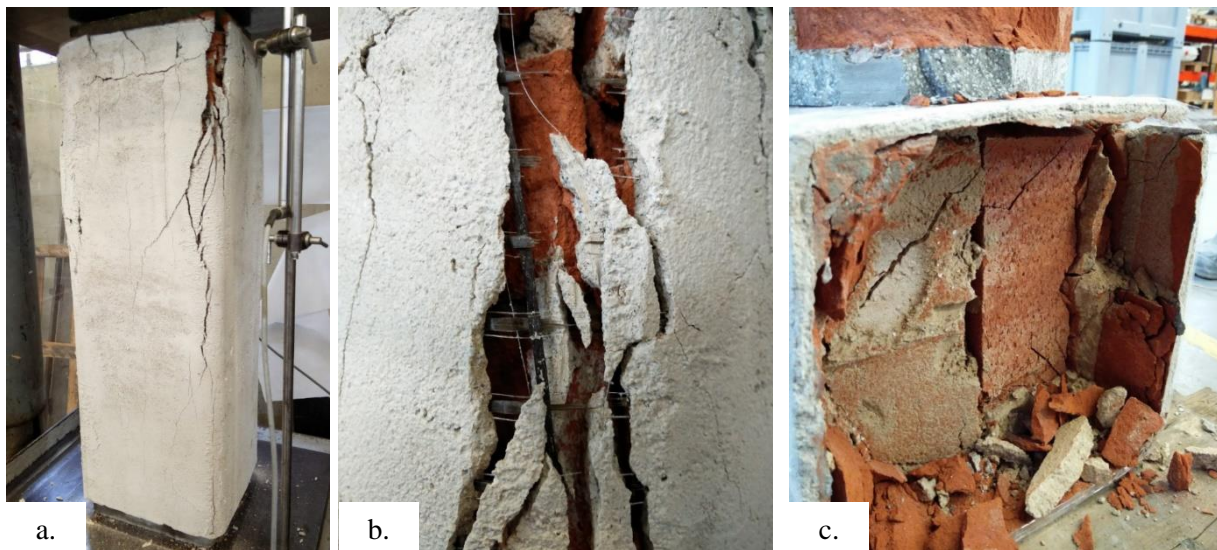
Failure mode of specimen C-LDB-S-5 (a,b) and crushing of the masonry core (c) for specimen C-LDB-R-5.
